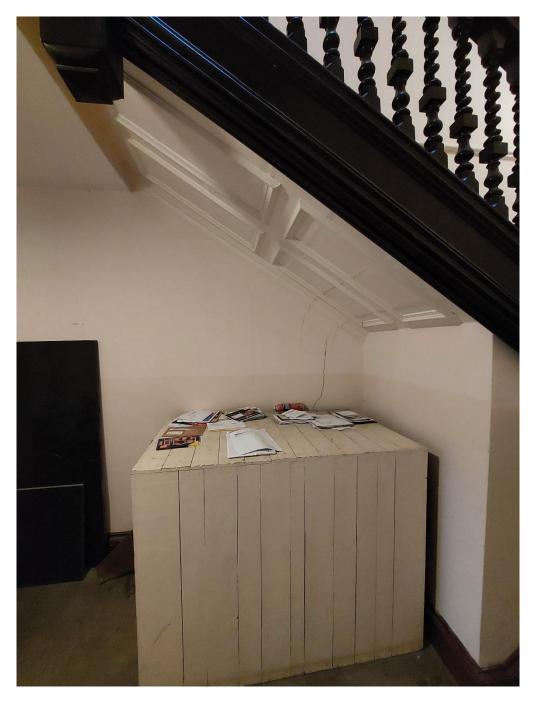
Minor cracking to ground floor party wall and cantilever stair
